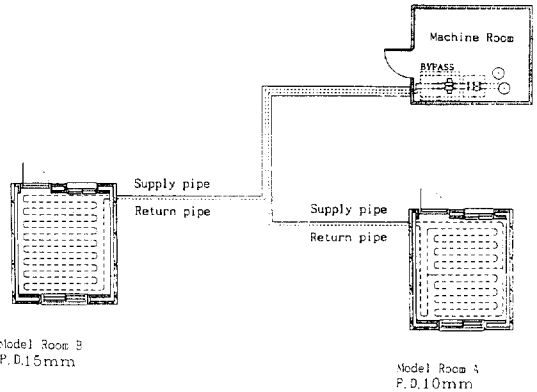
Schematic diagram of heating pipe network and a plot plan of test cell
